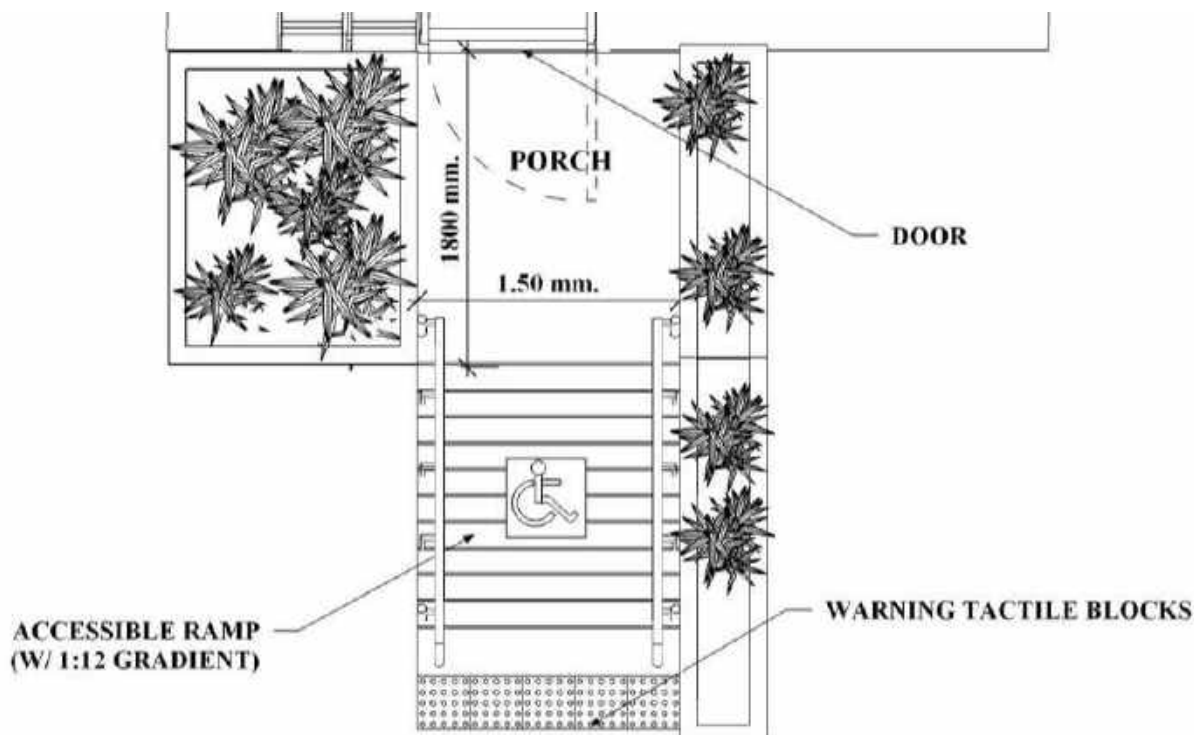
Image above shows an accessible building entrance with a 1.80 M deep entrance vestibule, an accessible ramp with handrails, and signage
